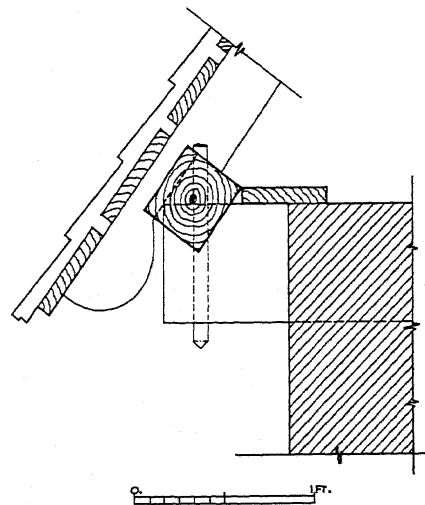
EAVES DETAIL OF A BRICK HOUSE,
